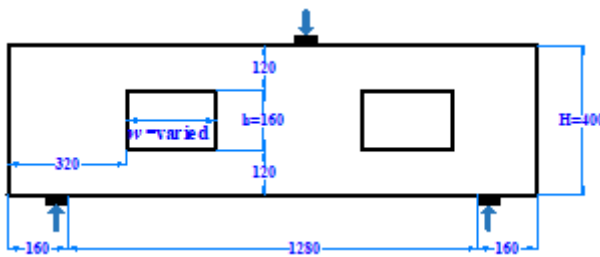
Layout of a typical tested beam for beams of Group A (beams without strengthening)
